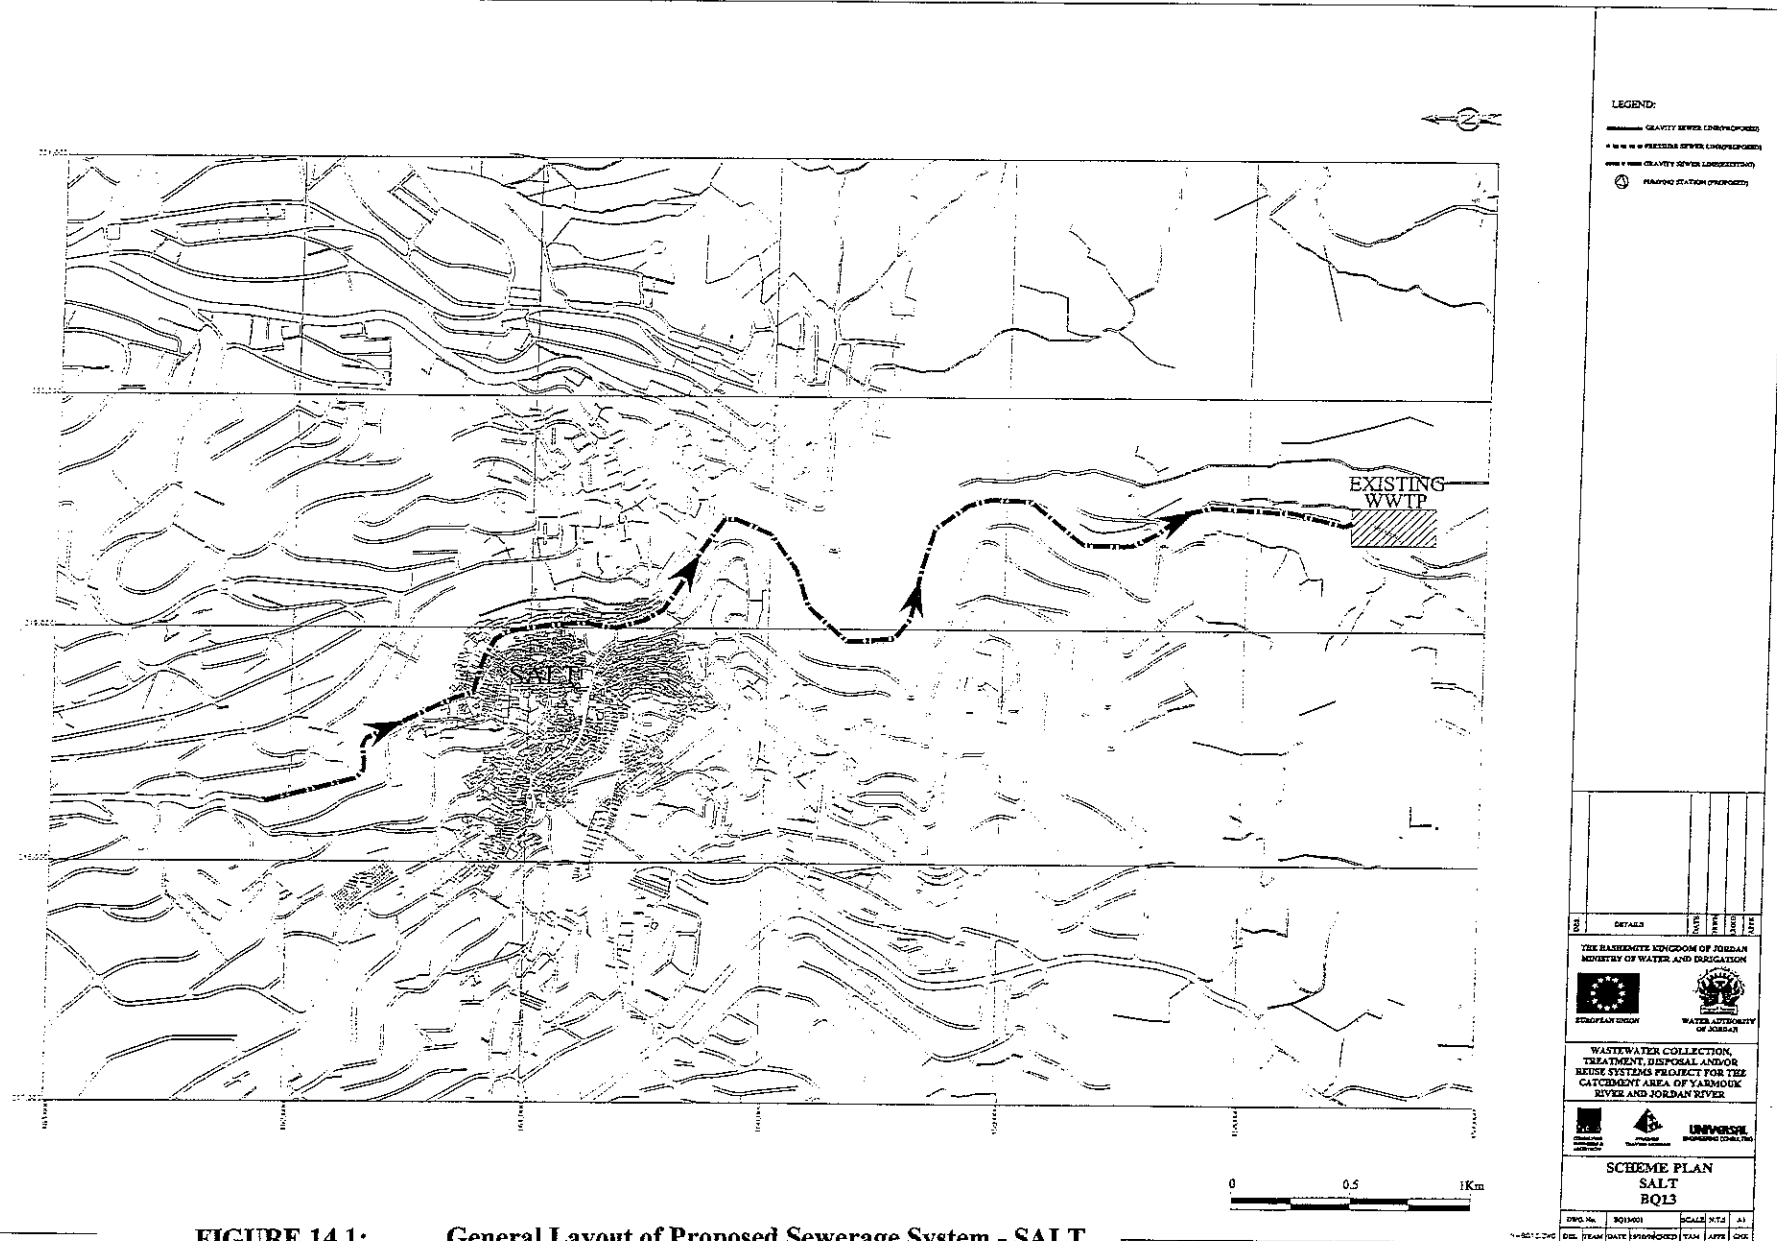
General Layout of Proposed Sewerage System - SALT
